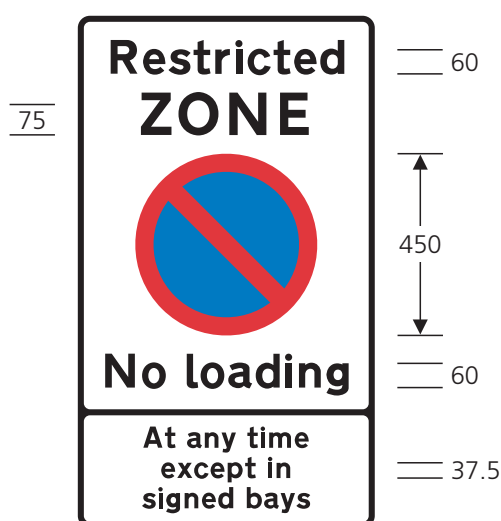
Entry to a restricted parking zone with provision for parking or loading in signed bays
